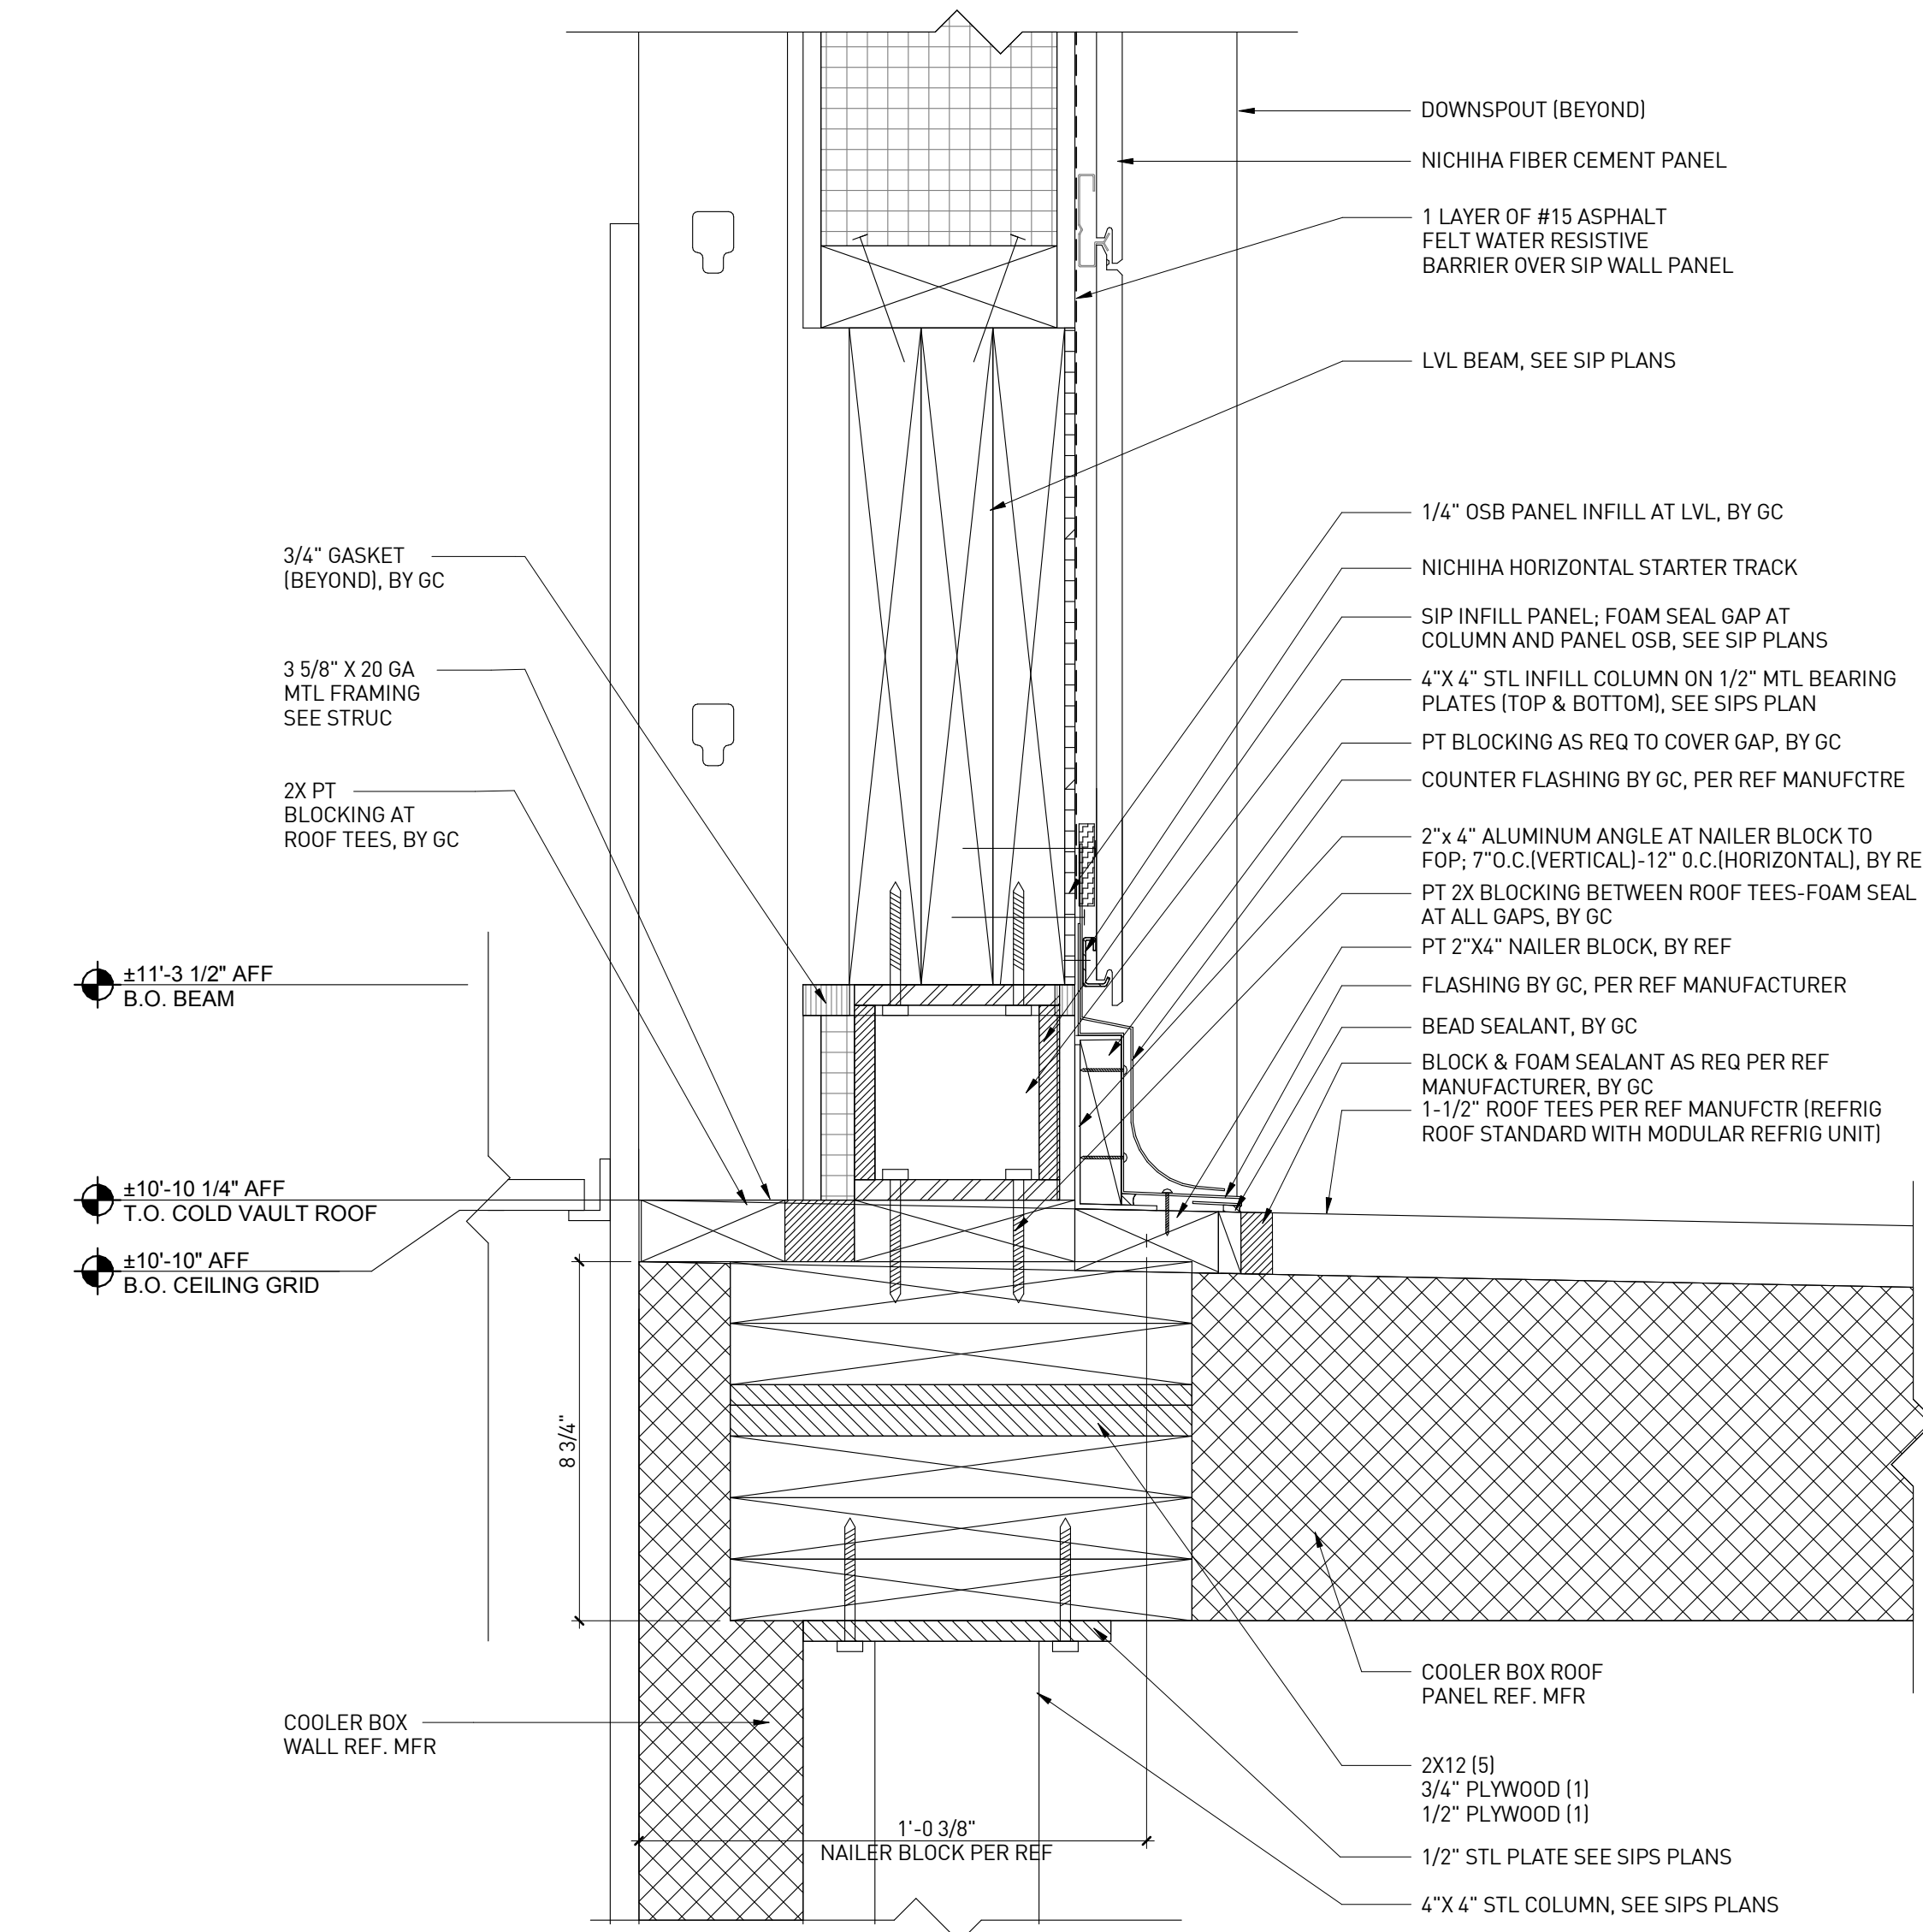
DETAIL AT REFRIGERATION PANEL & SIP WALL | 10
